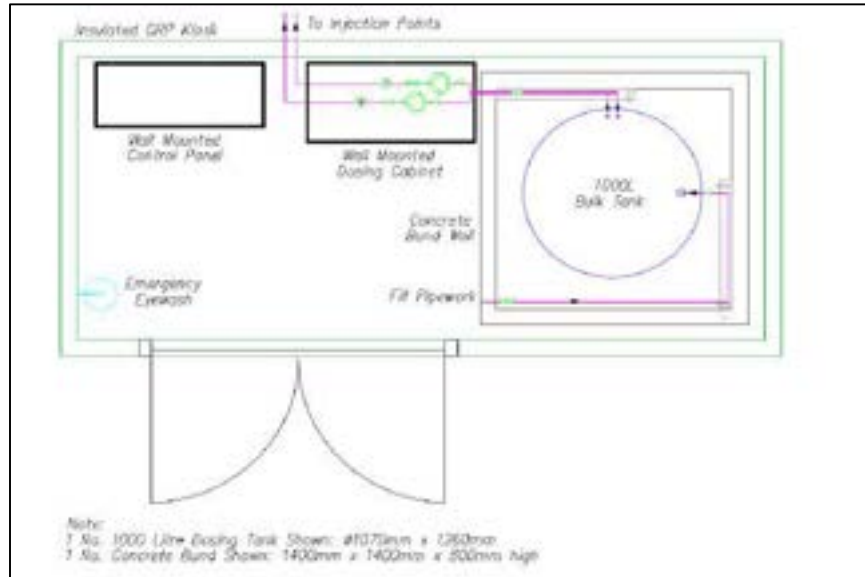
IW schematic of a bulk tank kiosk layout in H3PO4 Installation with 500 litres < bulk storage ≤ 6,000 litres.
